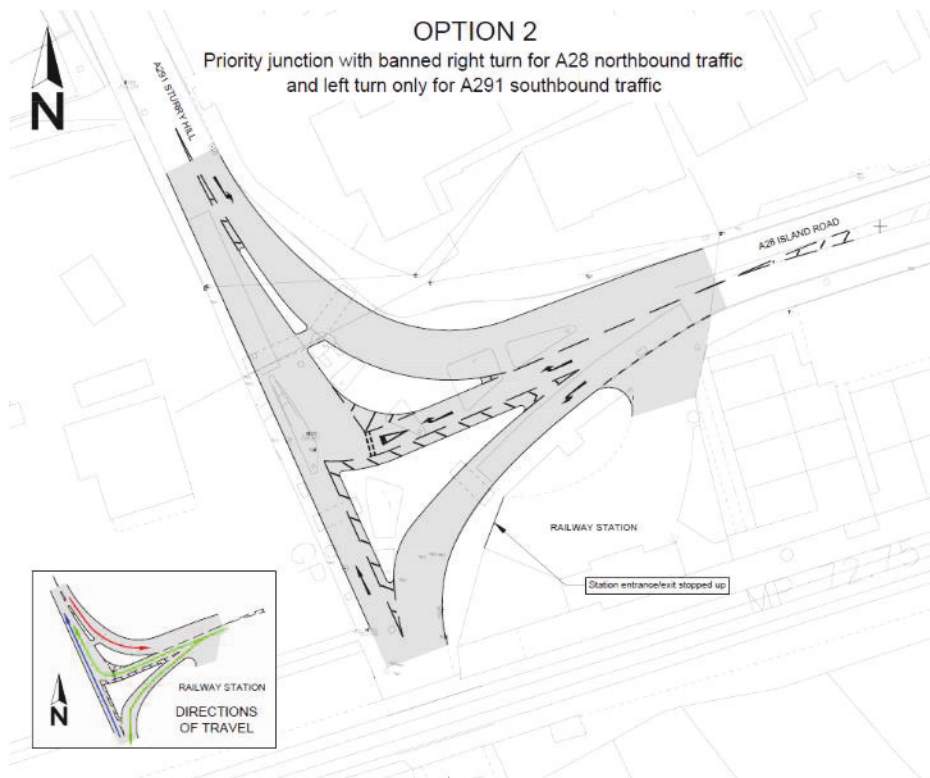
Option 2 for the Proposed Road Layout North of Sturry Level Crossing
